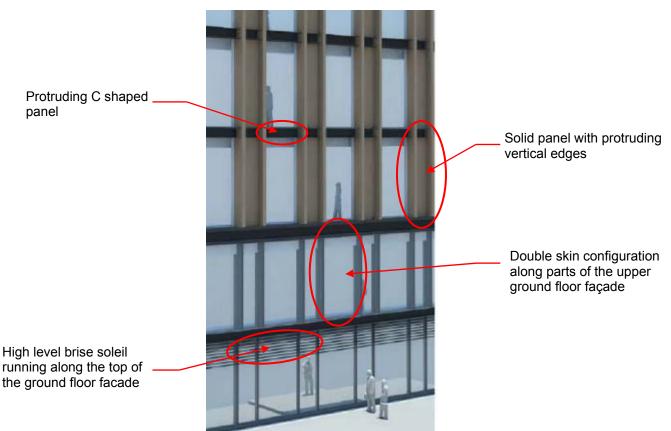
Building B1 – Image of typical south/east/west façade showing solid panels with protruding vertical edges and protruding C shaped spandrel panel running along the top of each floor.
